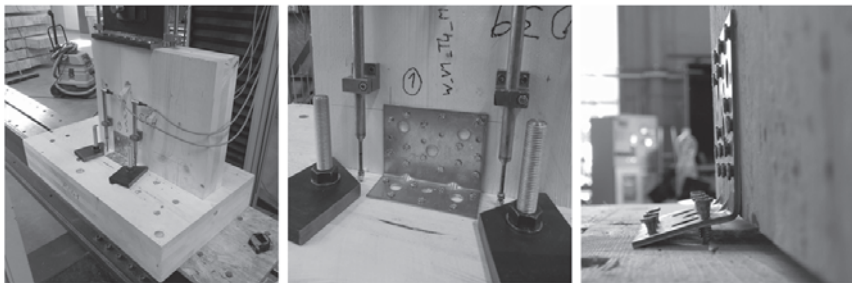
test configuration applied for tension loaded angle brackets in a wall-to-floor joint (internal designation W_V1_T4)
